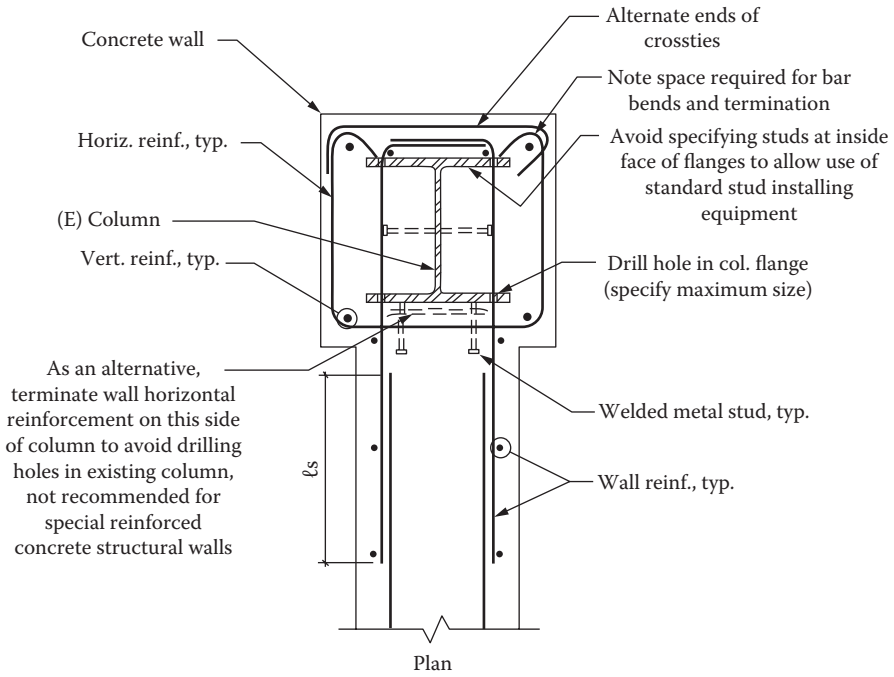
Cast-in-place concrete wall encasing existing column.
